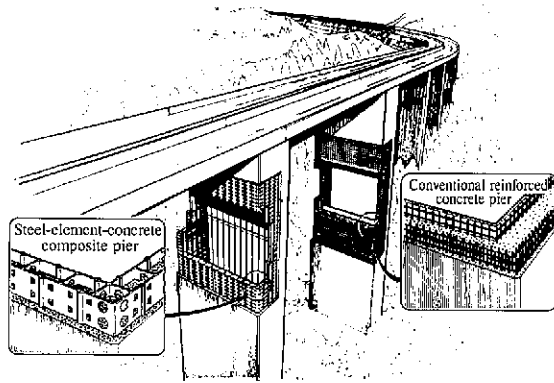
Schematic illustration of steel-element-concrete composite pier
